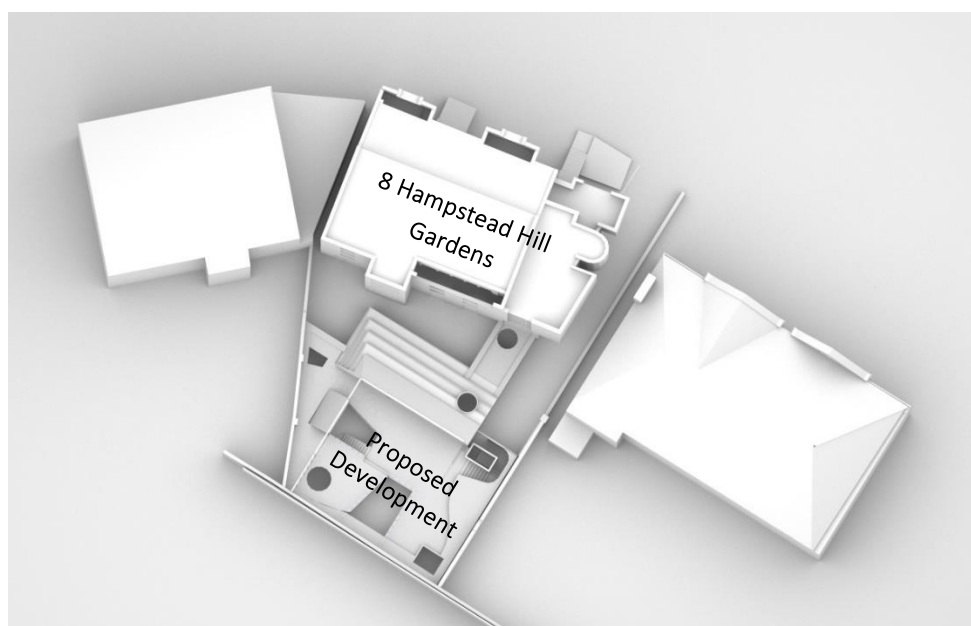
Proposed Development and 8 Hampstead Hill Gardens
